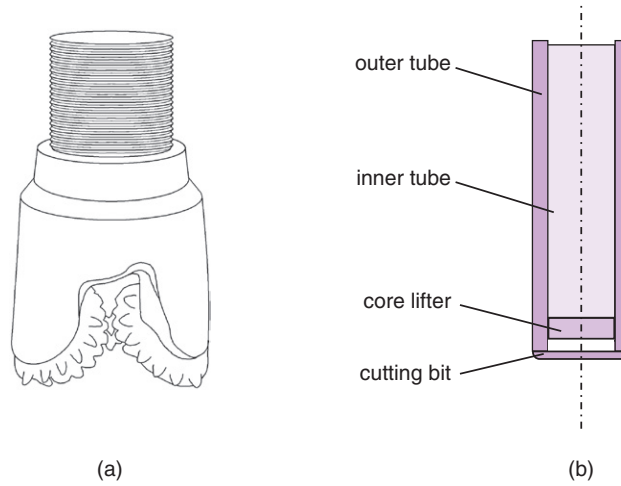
Rotary drilling bits: (a) cutting bit; (b) double-tube core barrel.
